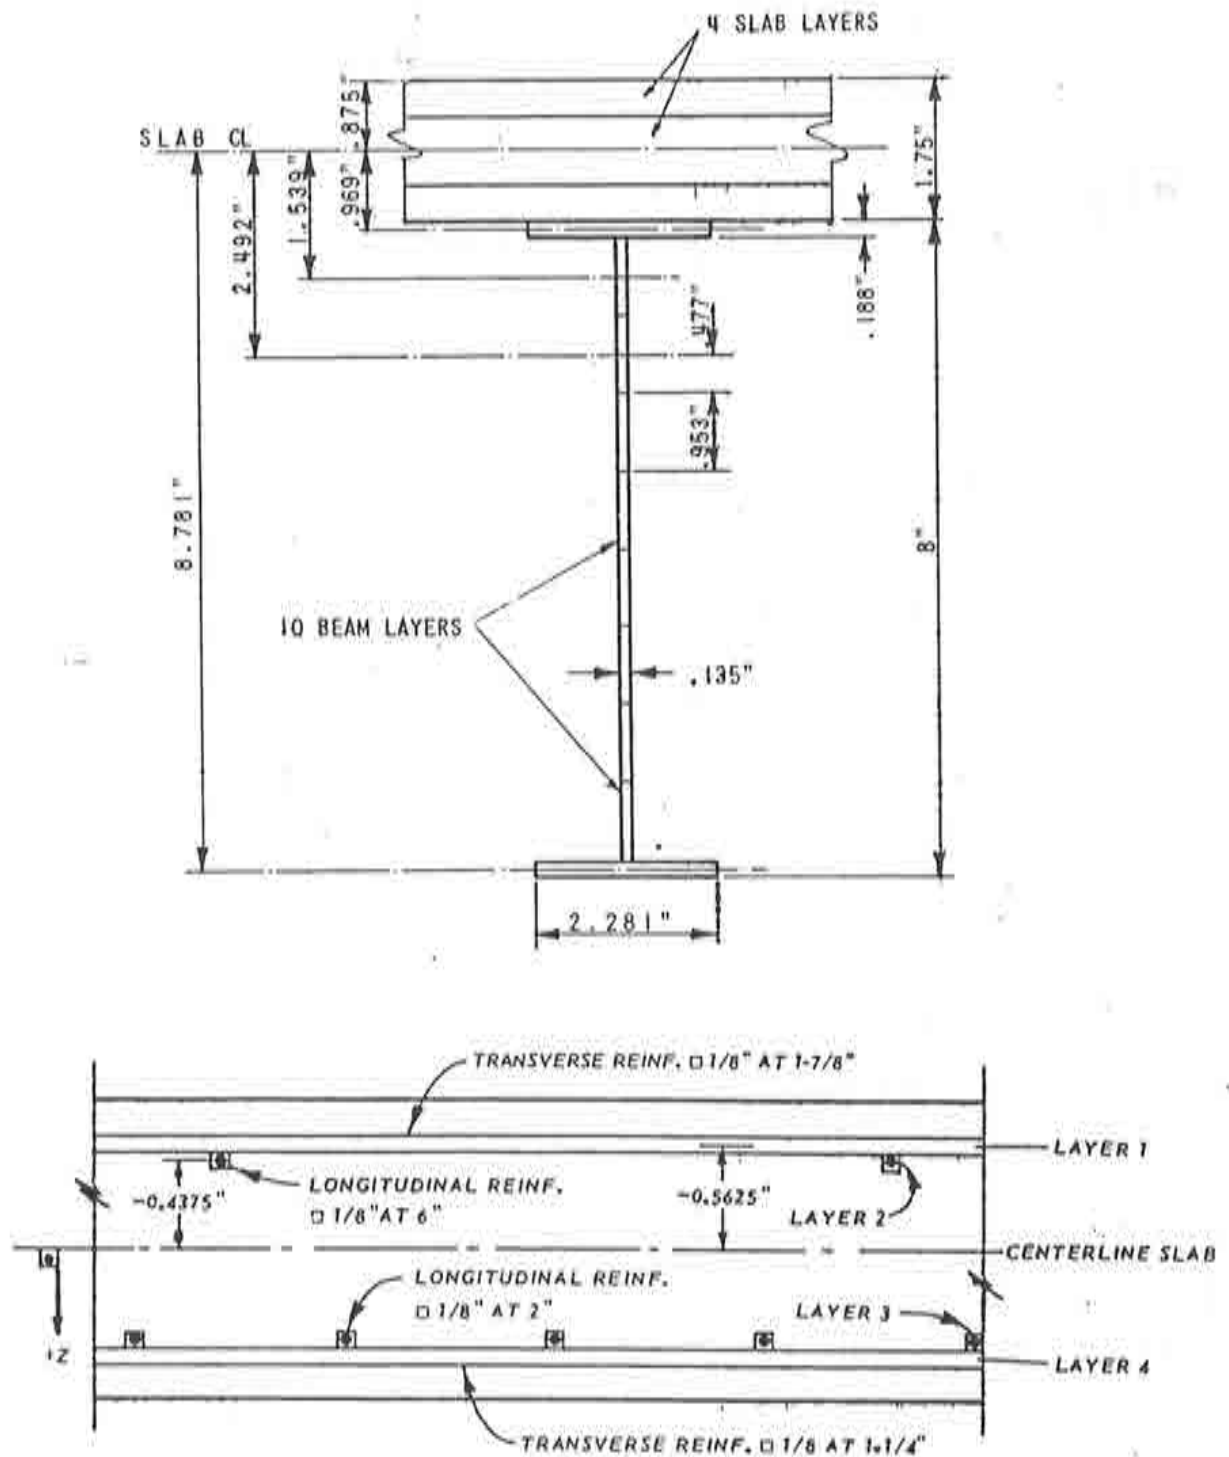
Simply supported mixed steel-concrete bridge. Layer discretization and reinforcement distribution in slab for two central load case.
